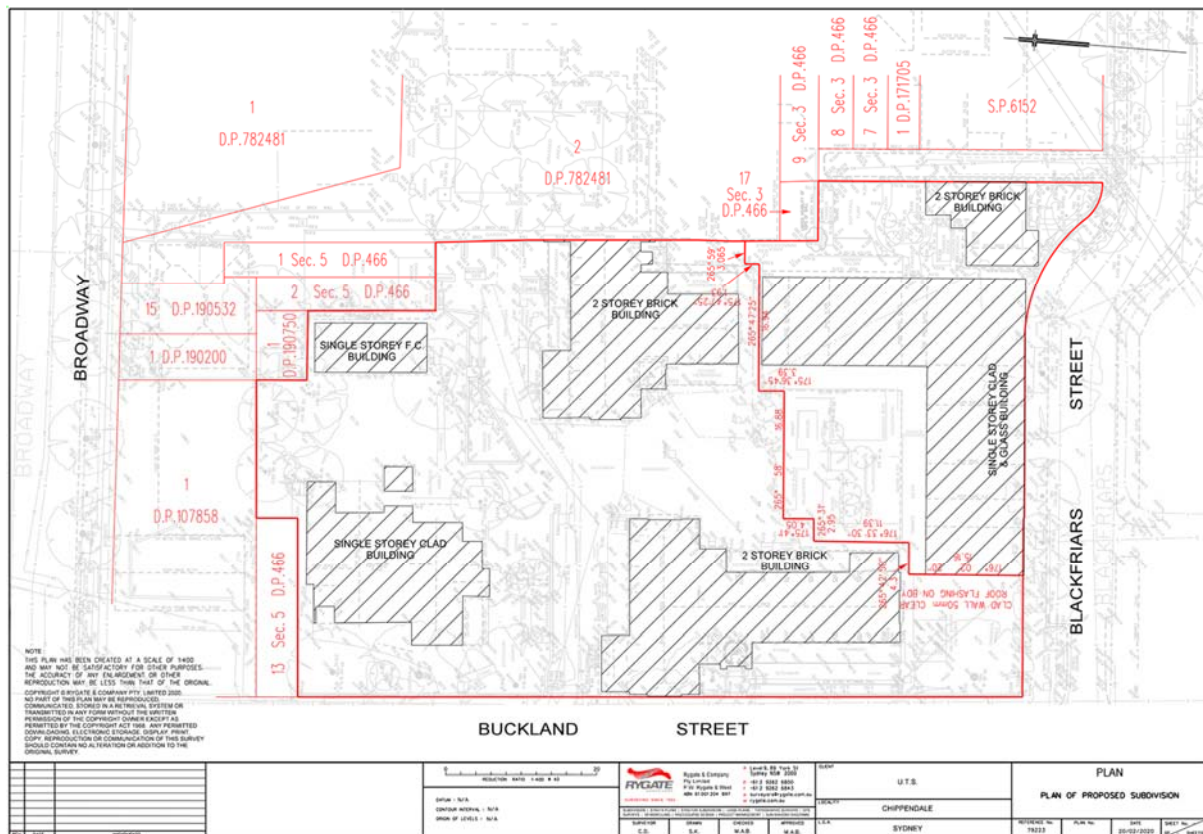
| Plan of proposed two lot subdivision (Source: Modification Report)
